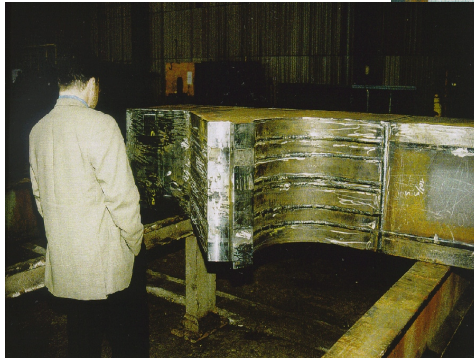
Steel bridge on top of towers to bear suspended storeys of a building
